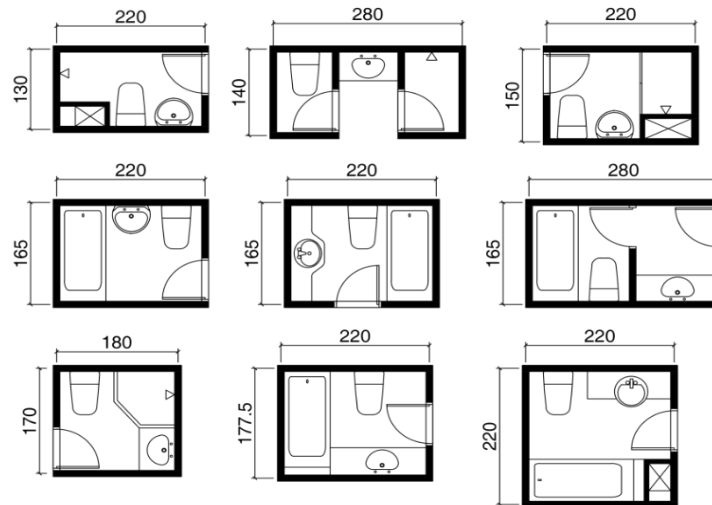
Domestic typical bathroom unit in common (unit : cm)
